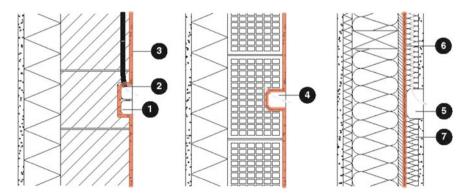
Electrical conduits: (1) electrical installation box, (2) sealing plugs, (3) plaster, (4) airtight electrical installation box, (5) installation housing, (6) air barrier, (7) installation level
